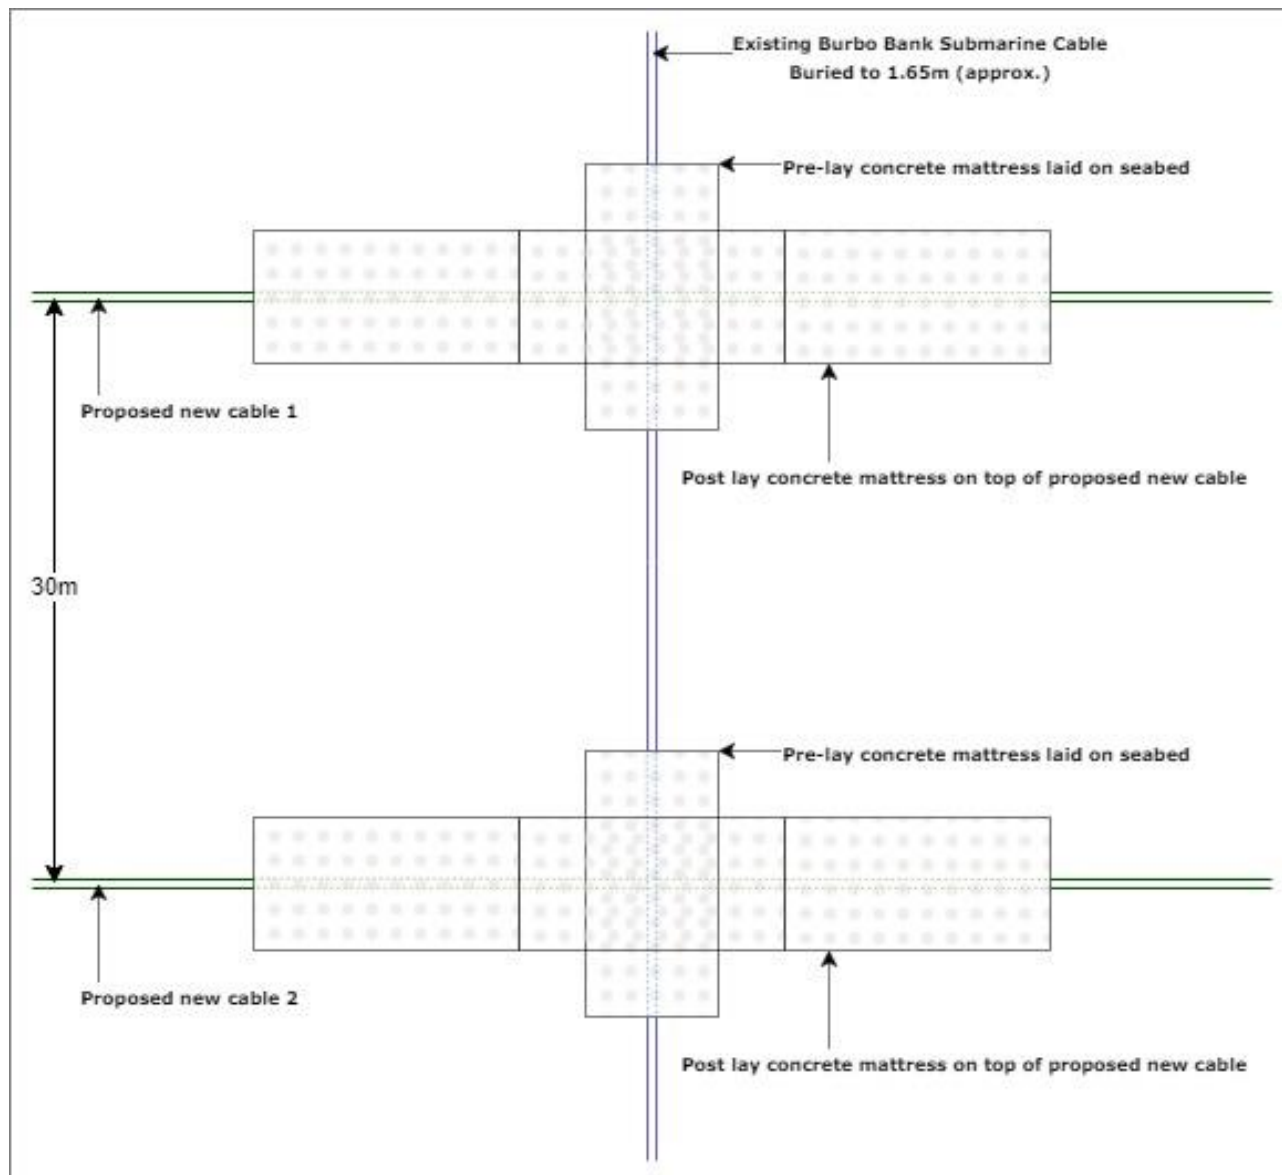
Final Crossing Design Schematic for Burbo Wind Farm Extension Cable Crossing
